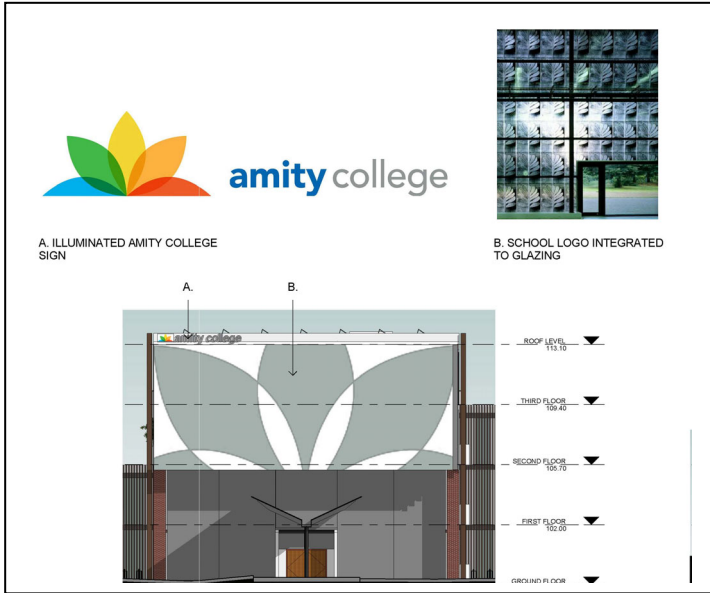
The Amity College Logo Artwork will be incorporated in a restrained fashion into the building façade over the main entry
